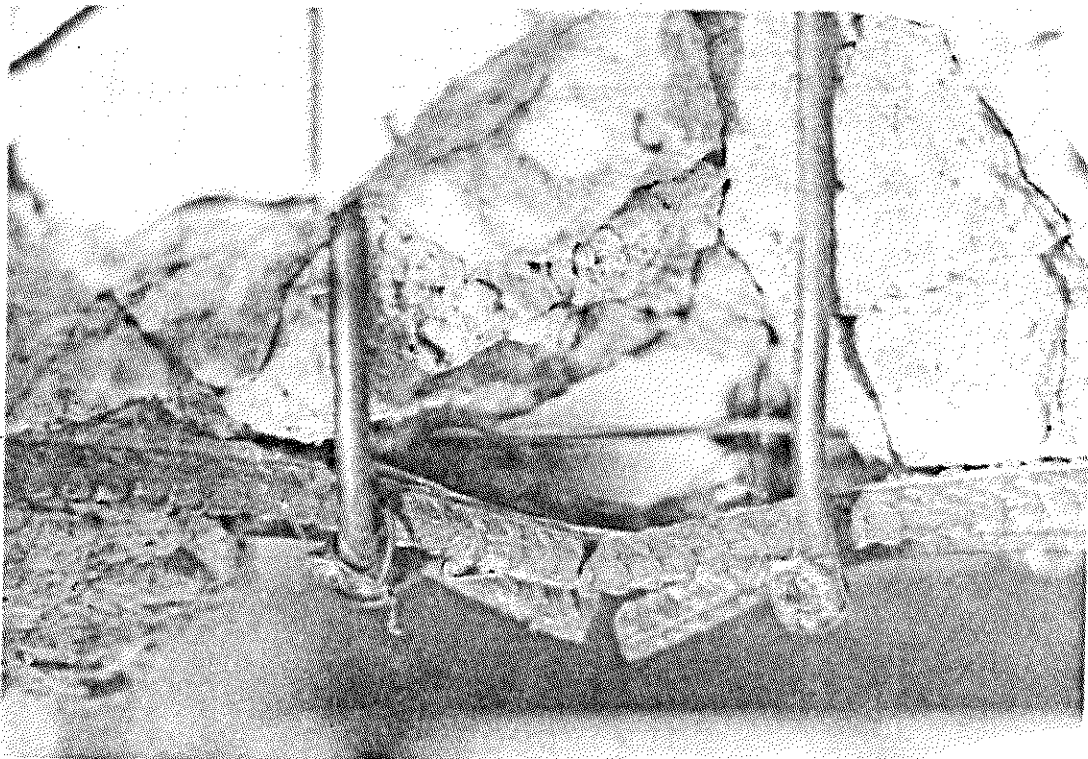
(b) Fractured Bottom Reinforcement, Beam F-1
